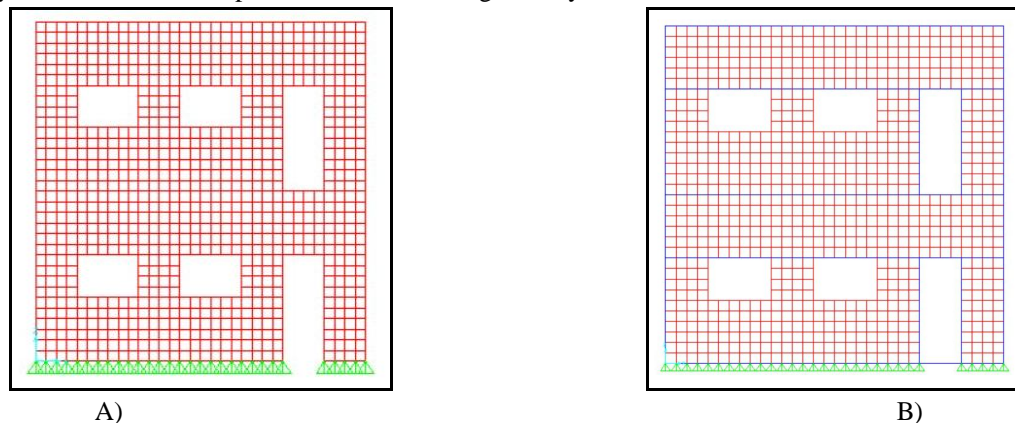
Modelling of Masonry building without and with the bond beam in SAP2000
